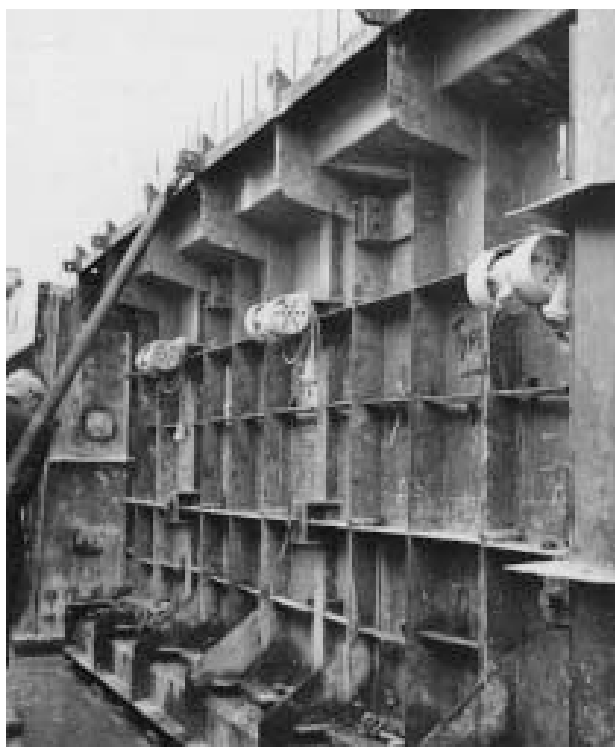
Electric form vibrators attached to the steel formwork of a bridge girder
